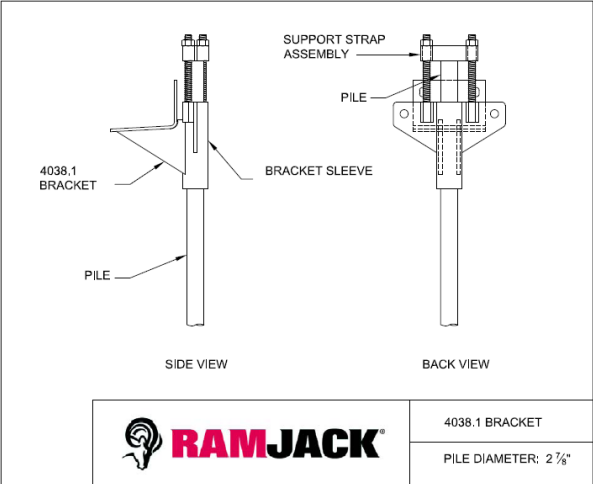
4038.1 SUPPORT BRACKET AND PILING
